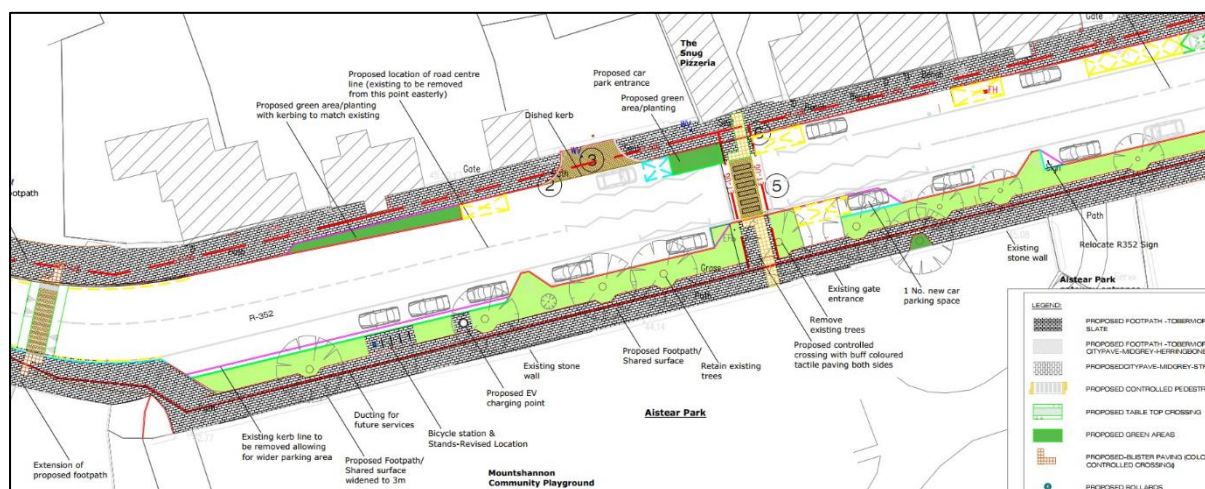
Layout Plan of Proposed Main Street Public Realm Works at Proposed Village Car Park Entrance Location
